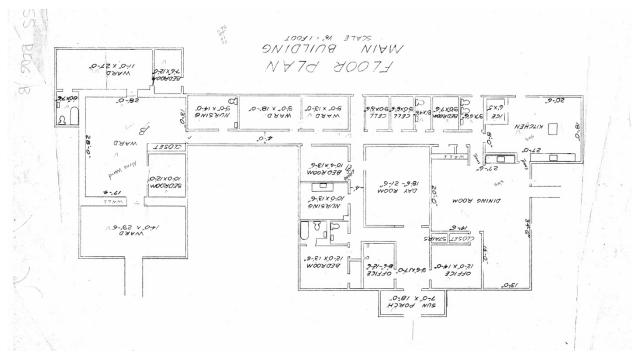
Building B Floor Plan, C.L. Hunt, 1934.
